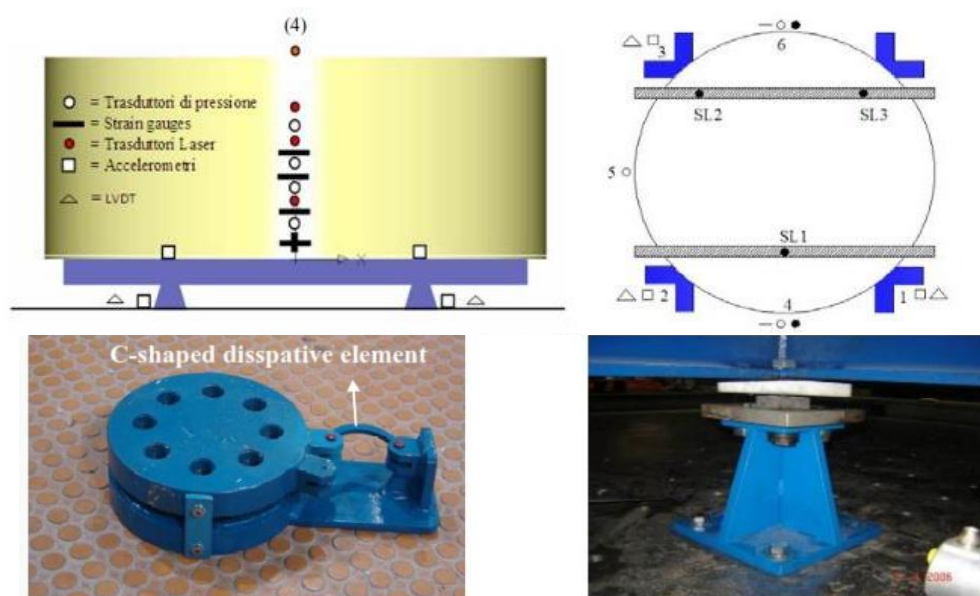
(a) Experimental Set-up; (b) Sliding bearing with dissipative damper; (c) High Damping Rubber Bearing (De Angelis et al., 2008)
